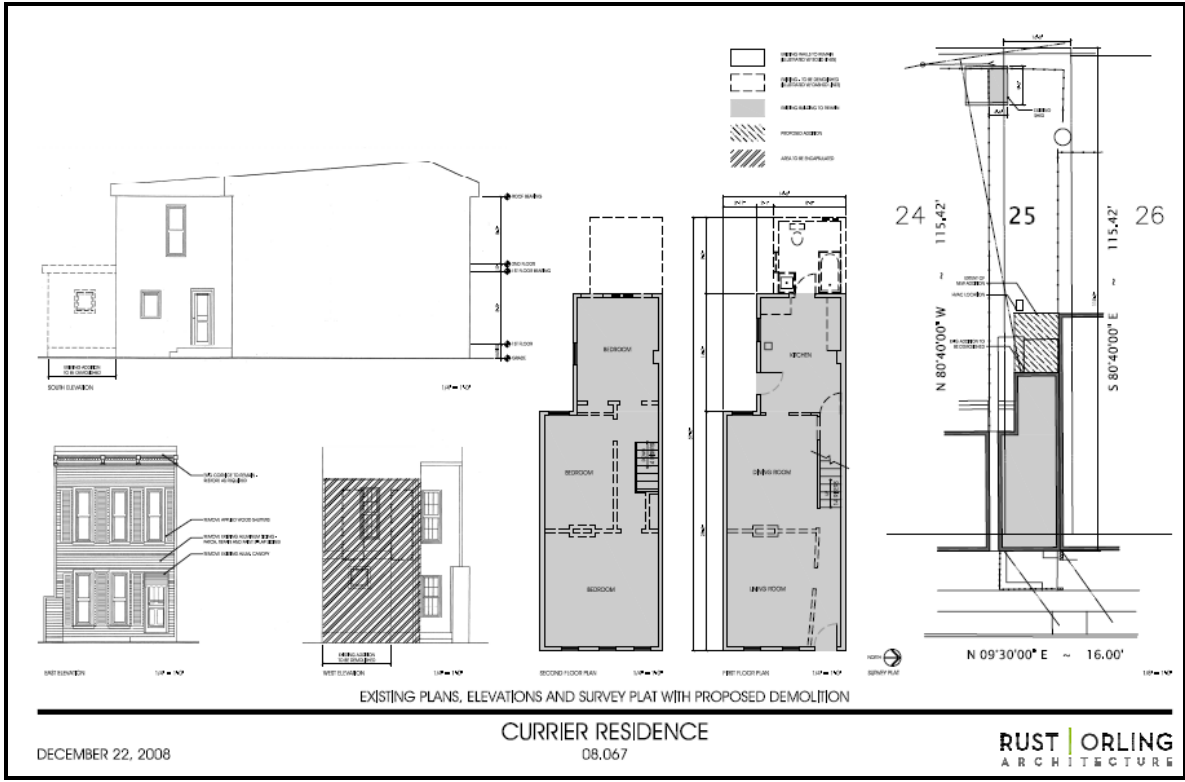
Site Plan and Extent of Demolition/Encapsulation
